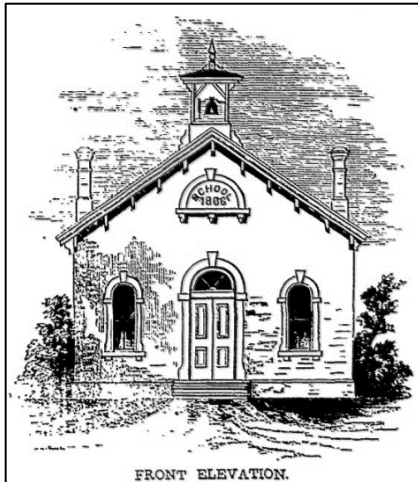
Prospective one-room schoolhouse design (*The Canada Farmer*, Vol. 3, no. 12, p.189)
